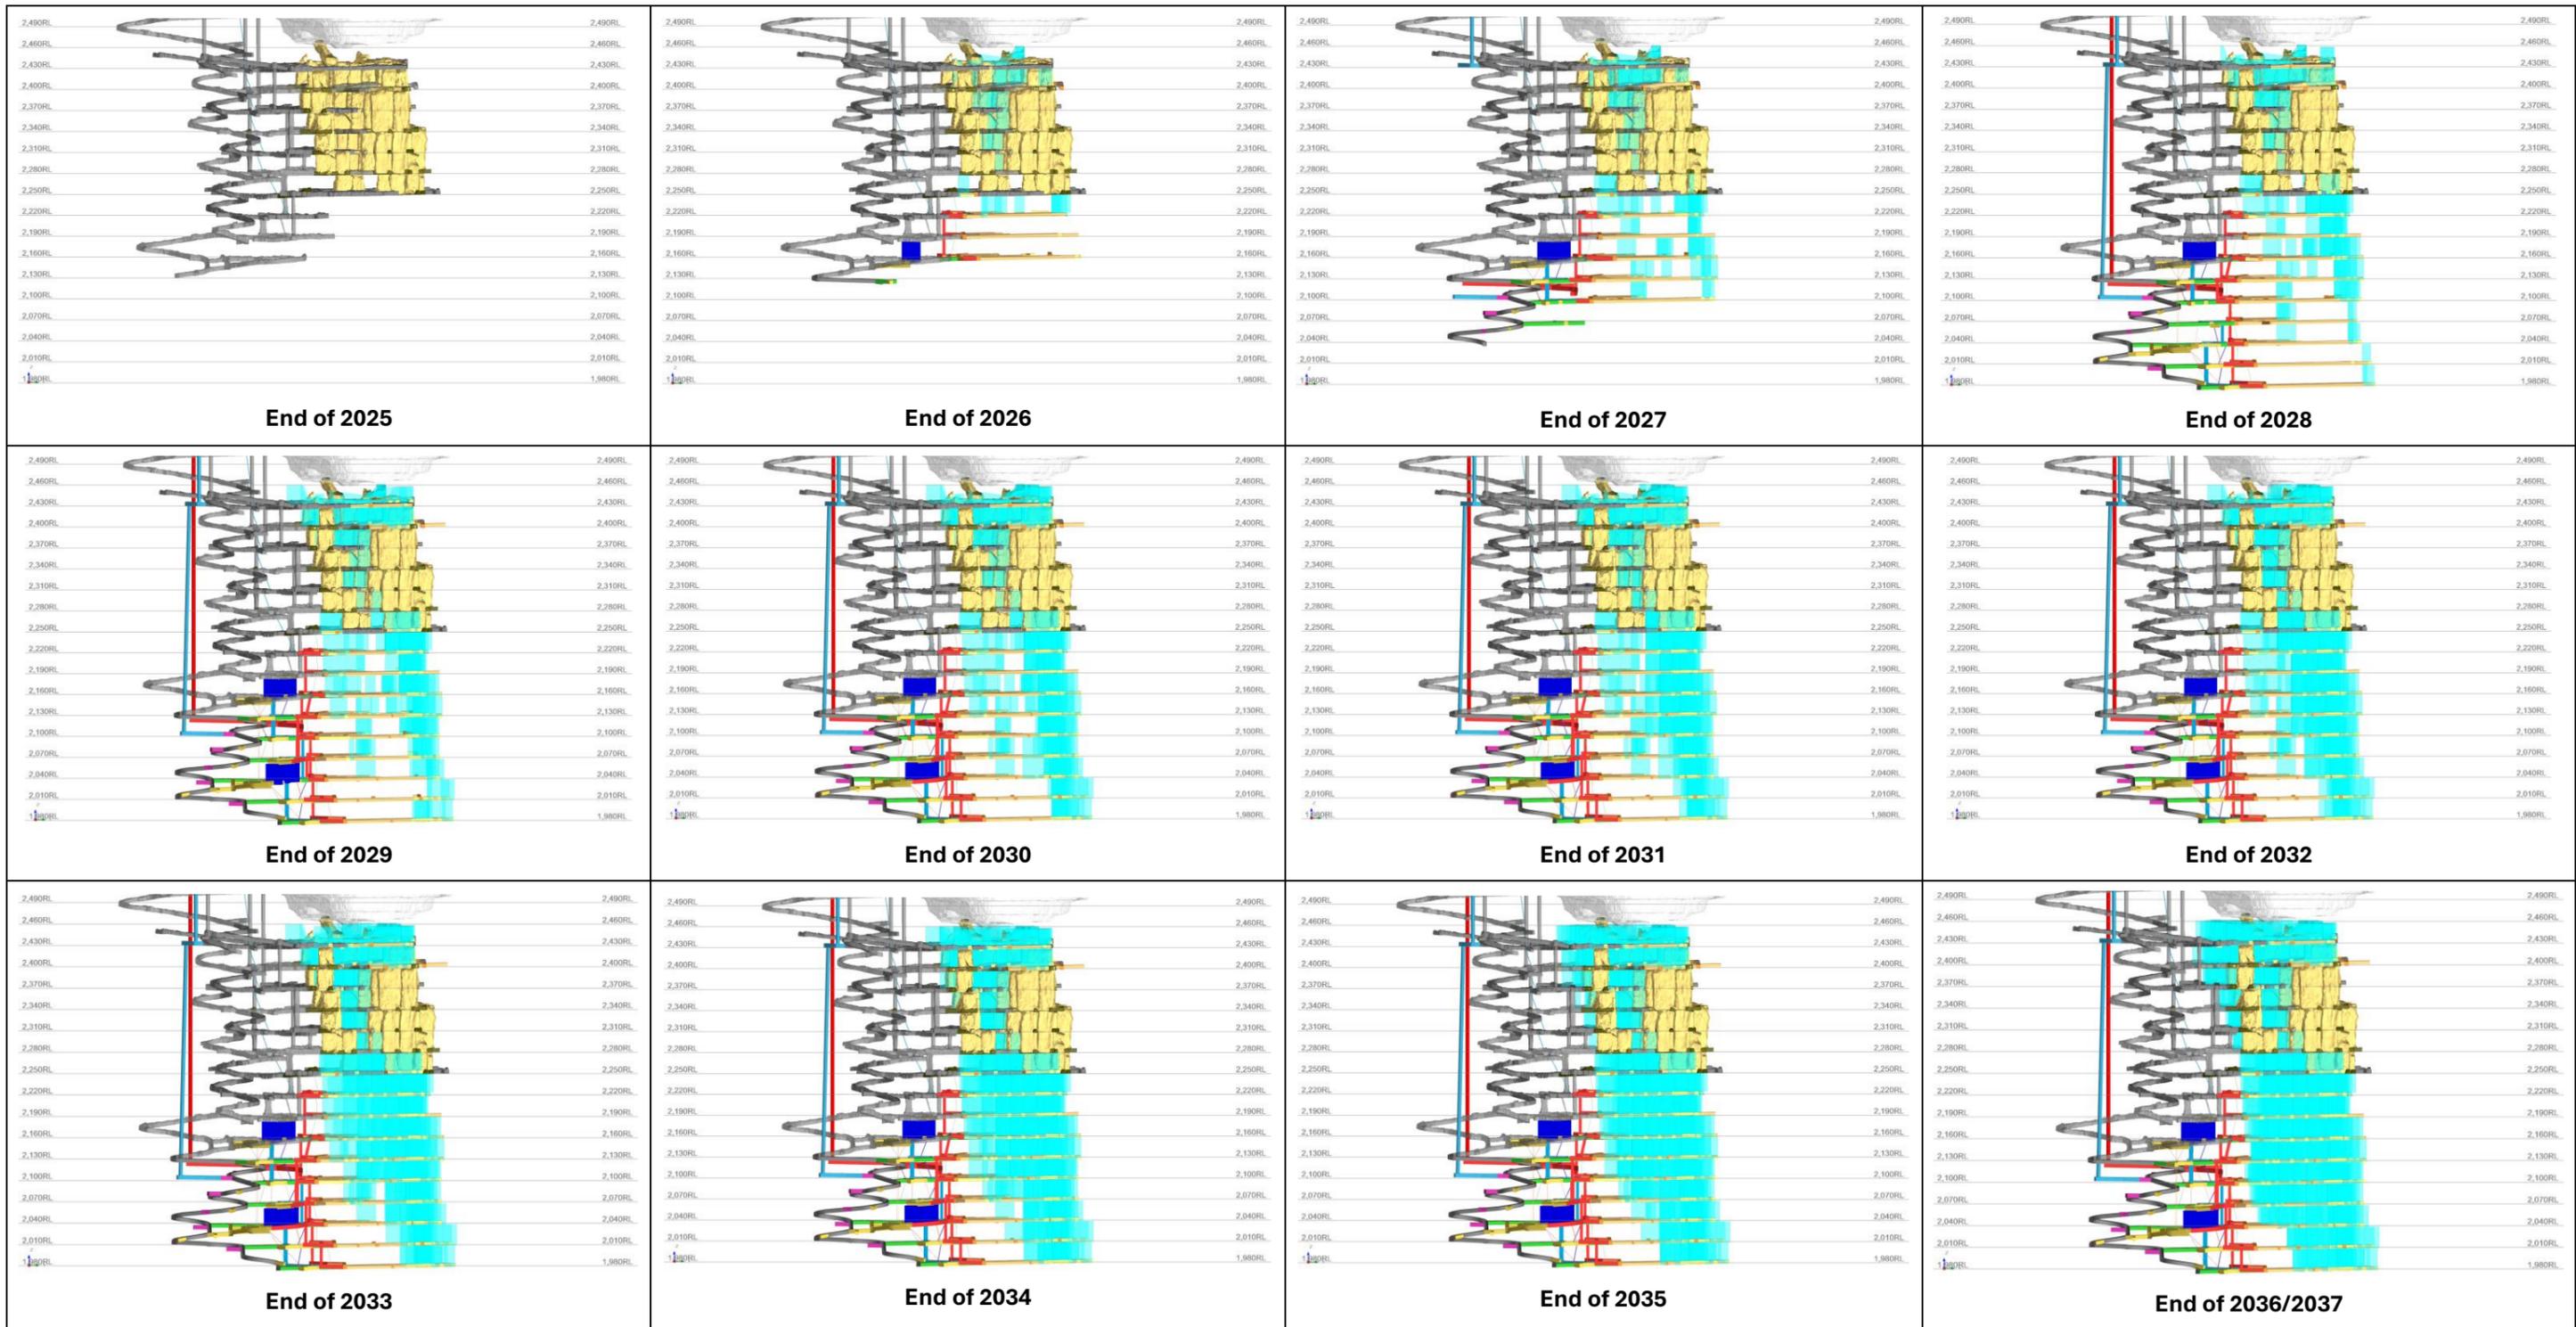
Underground Sequence By Year - Section Looking North-West
